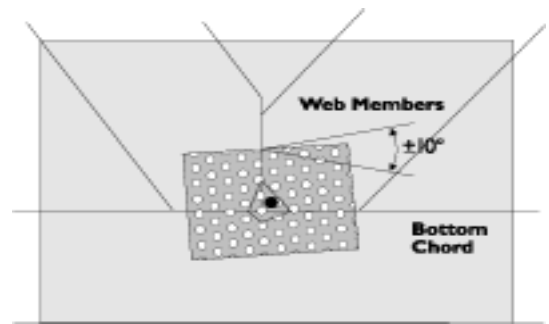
VELUM JOINT QC DETAIL INSPECTION SHEET POSITIONED OVER THE TRUSS JOINT FOR INSPECTION.
